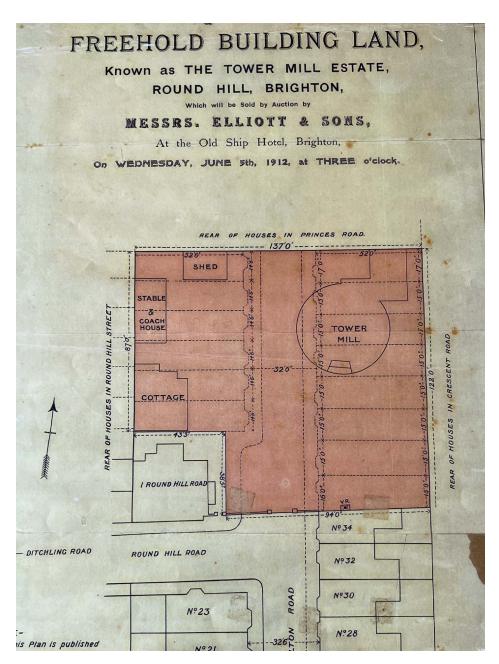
Plan of Freehold Building Land on the Tower Mill Estate 1912
